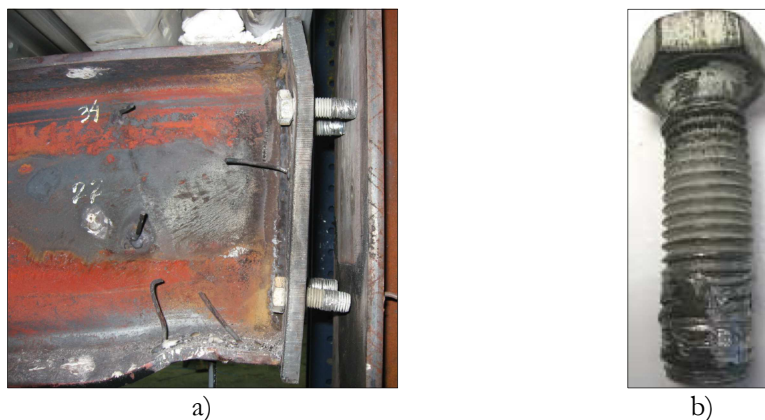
a) Joint failure and b) bolt stripping (Santiago, 2008)
